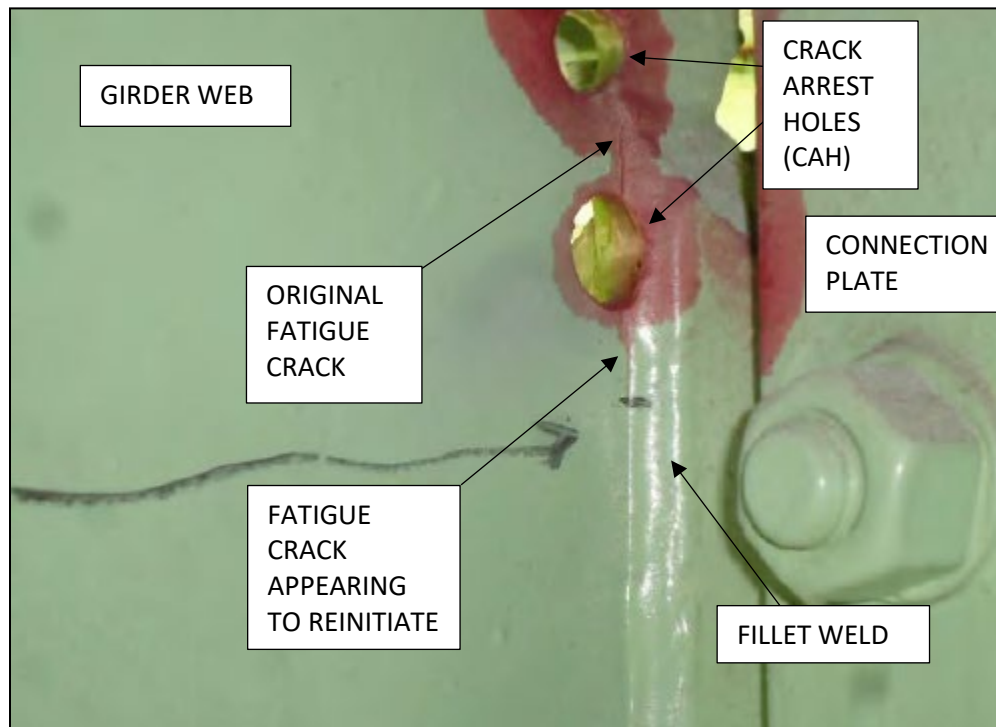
Distortion-induced fatigue cracking in girder web gap region at web-to-flange and end of connection plate-to-web weld toes produced by transverse member end rotation.
